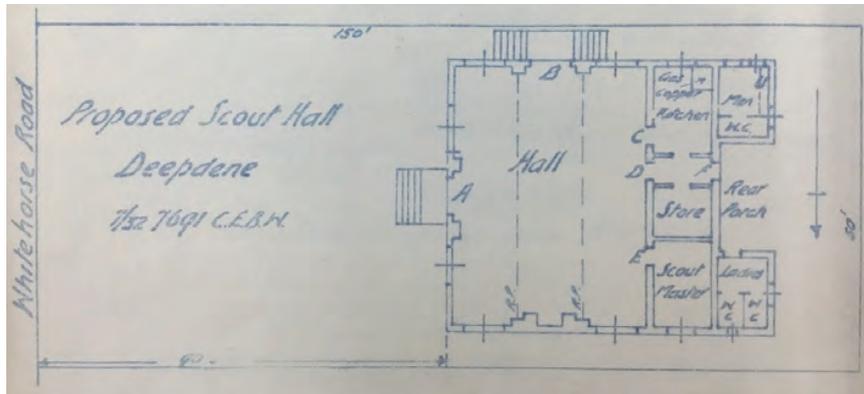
Original layout of Deepdene Scout Hall, c.1932. (Source: Public Building file, PROV)
